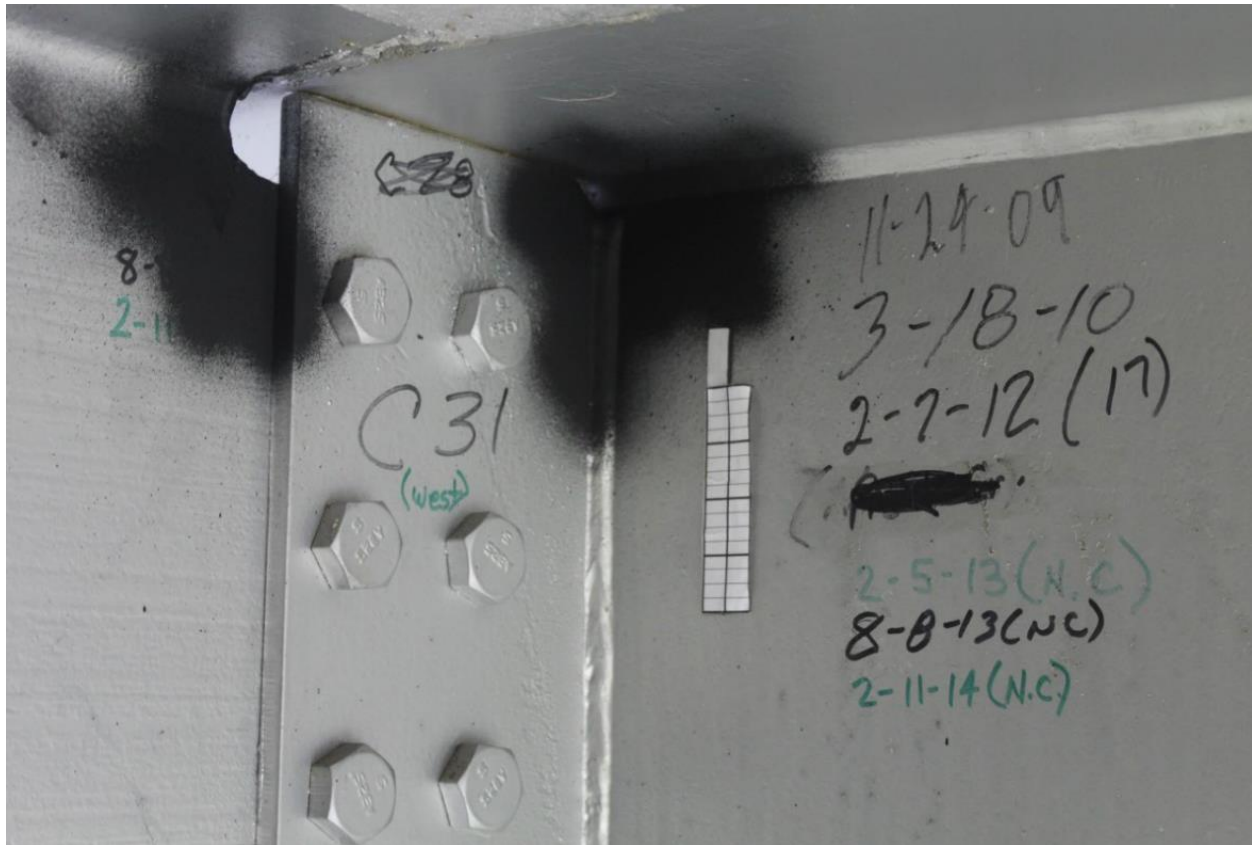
Floor-Beam Web Connection on I-64 Maury River Bridge
